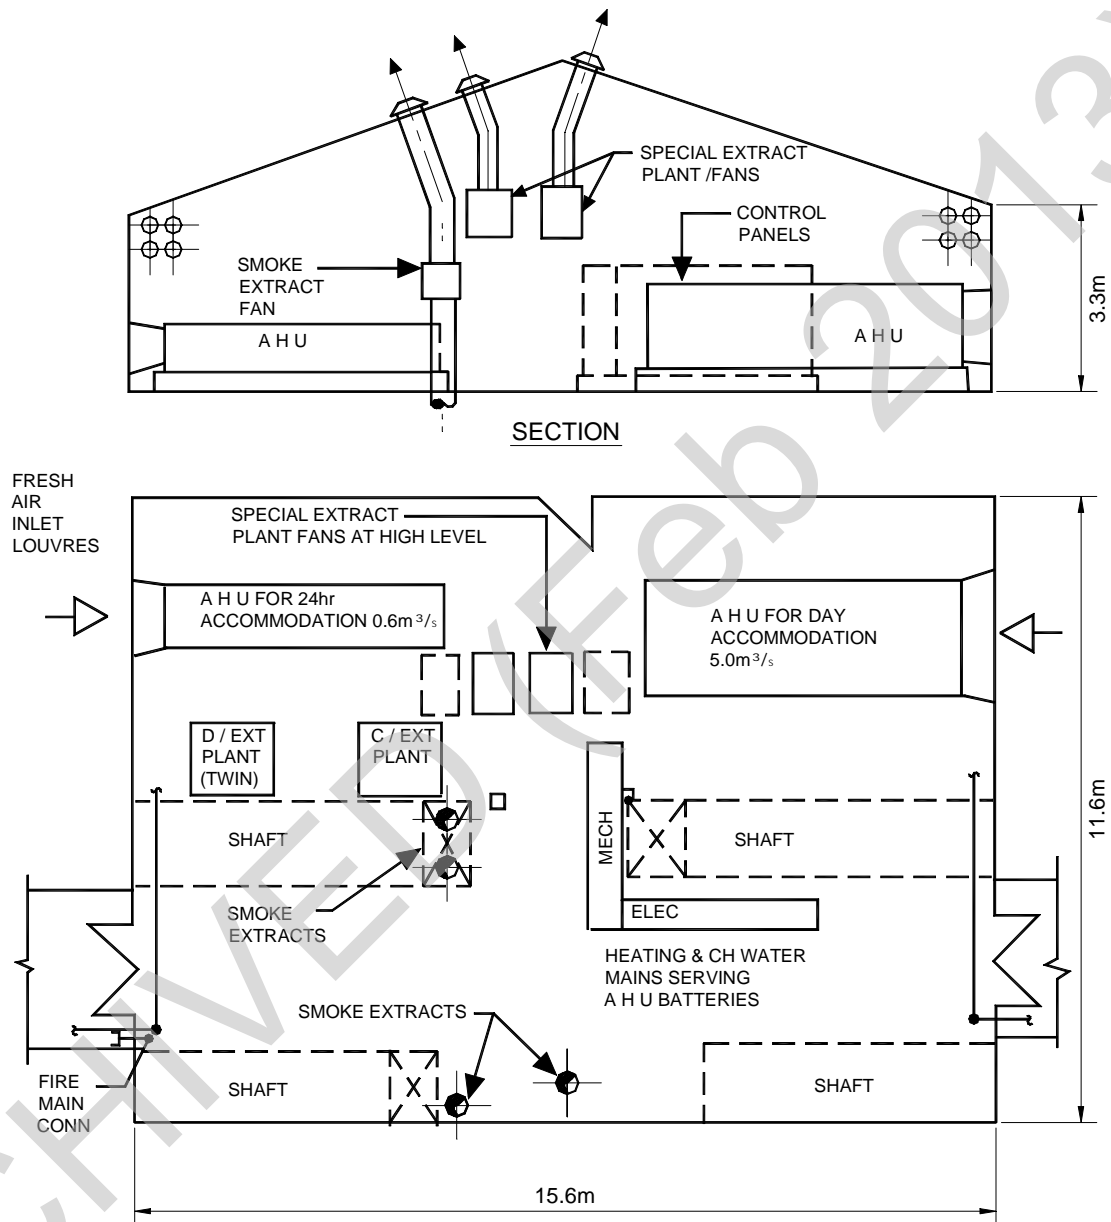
Typical plantroom 3 serving a combination of 24 hr and 9-5 accommodation departments
